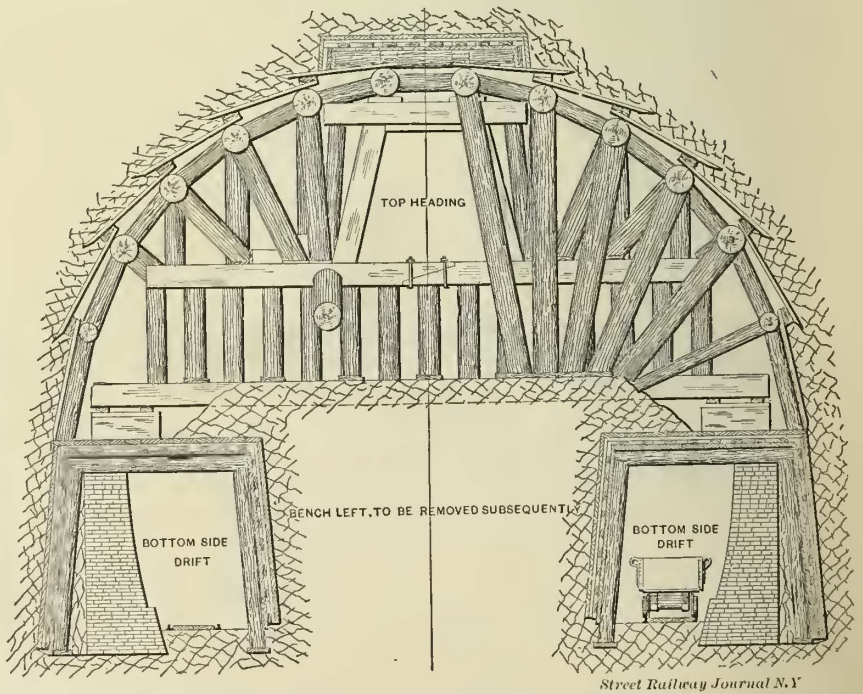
TRANSVERSE SECTION OF TUNNEL DURING CONSTRUCTION, TOP HEADING ENLARGED.—BALTIMORE BELT RAILWAY.
